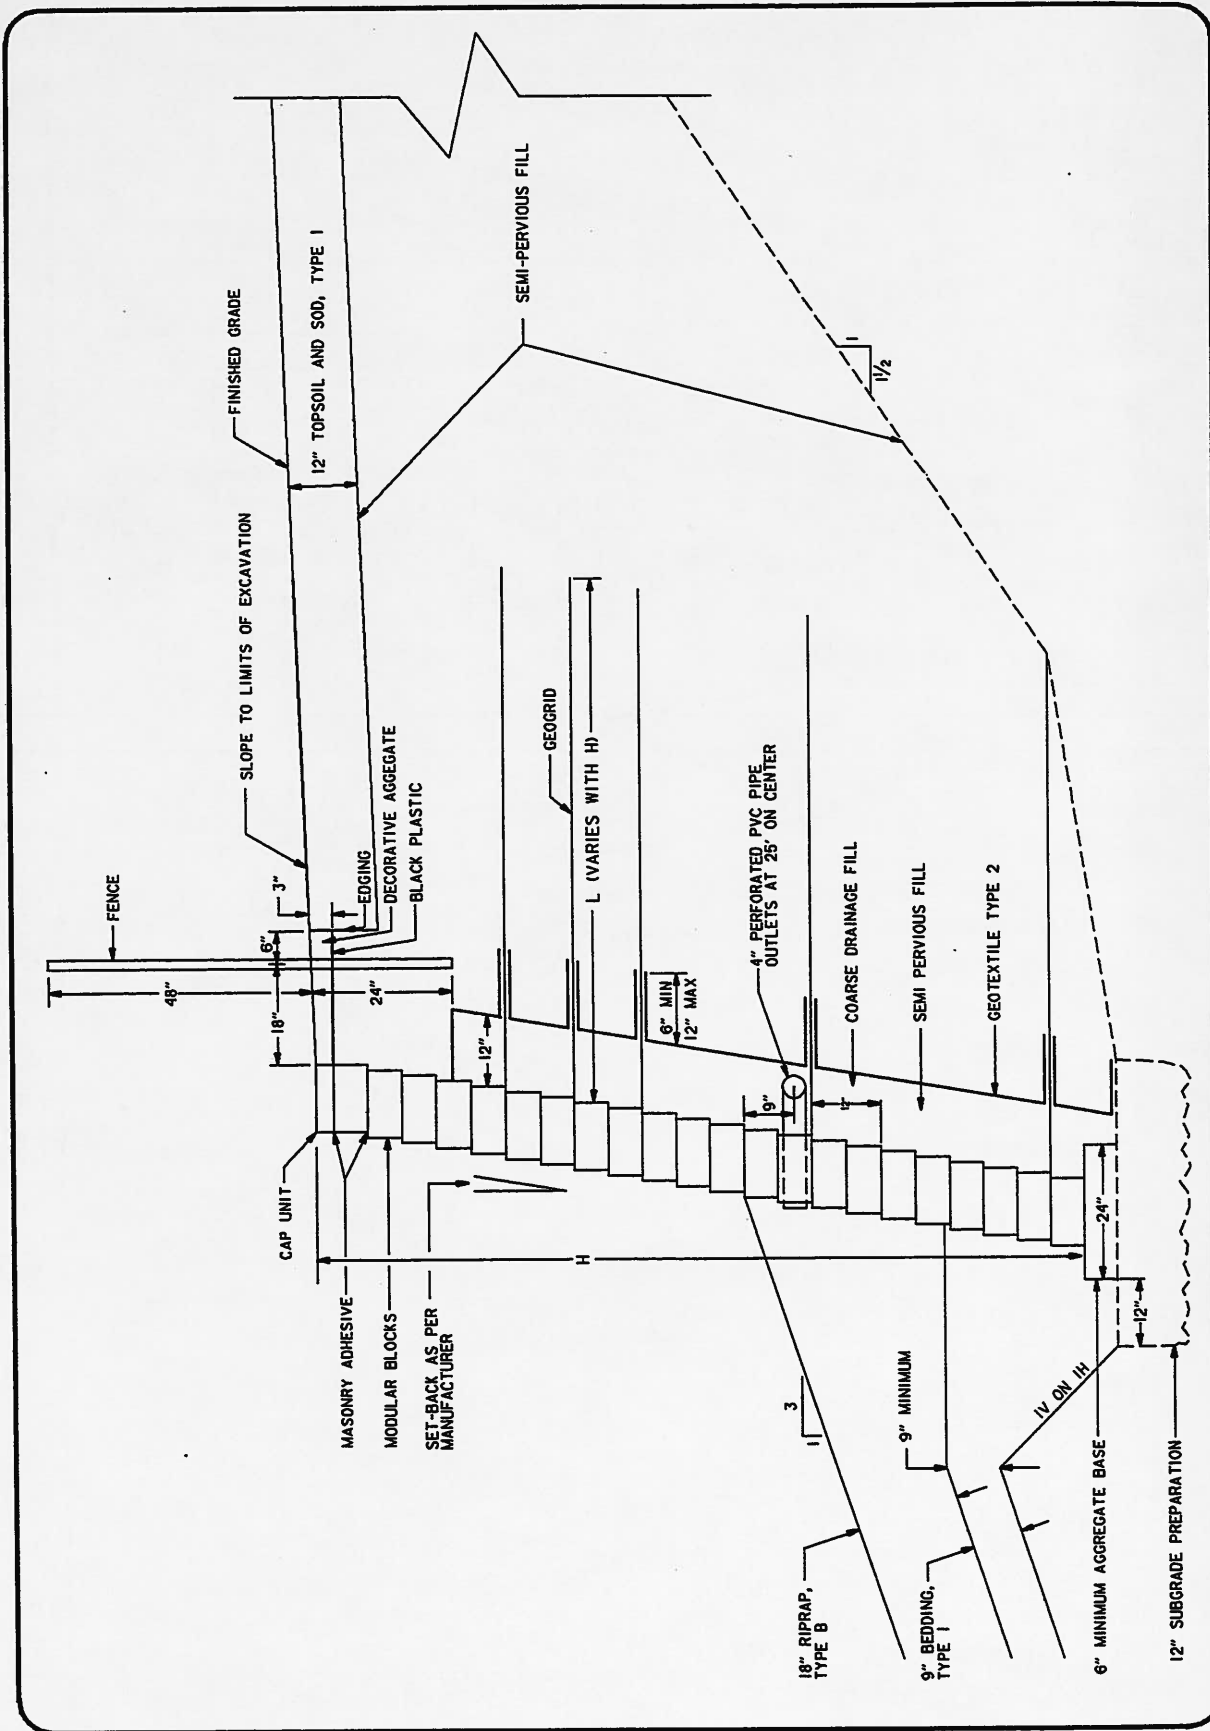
Typical retaining wall section for exposed wall 5 feet or higher
